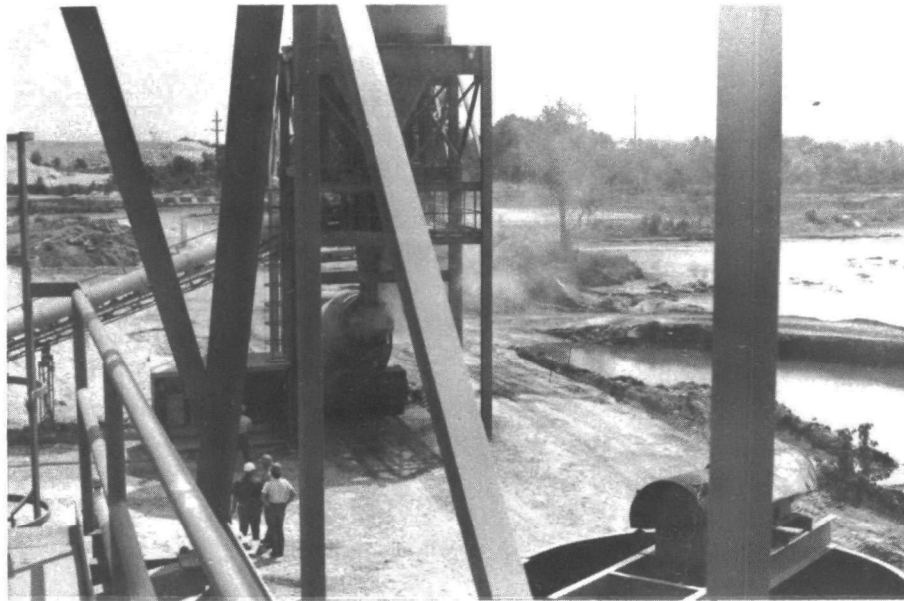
Another view of the sludge stabilization equipment during operation. About 200 pounds of lime and 400 pounds of fly ash are used to stabilize one ton of dry solids in the sludge.
